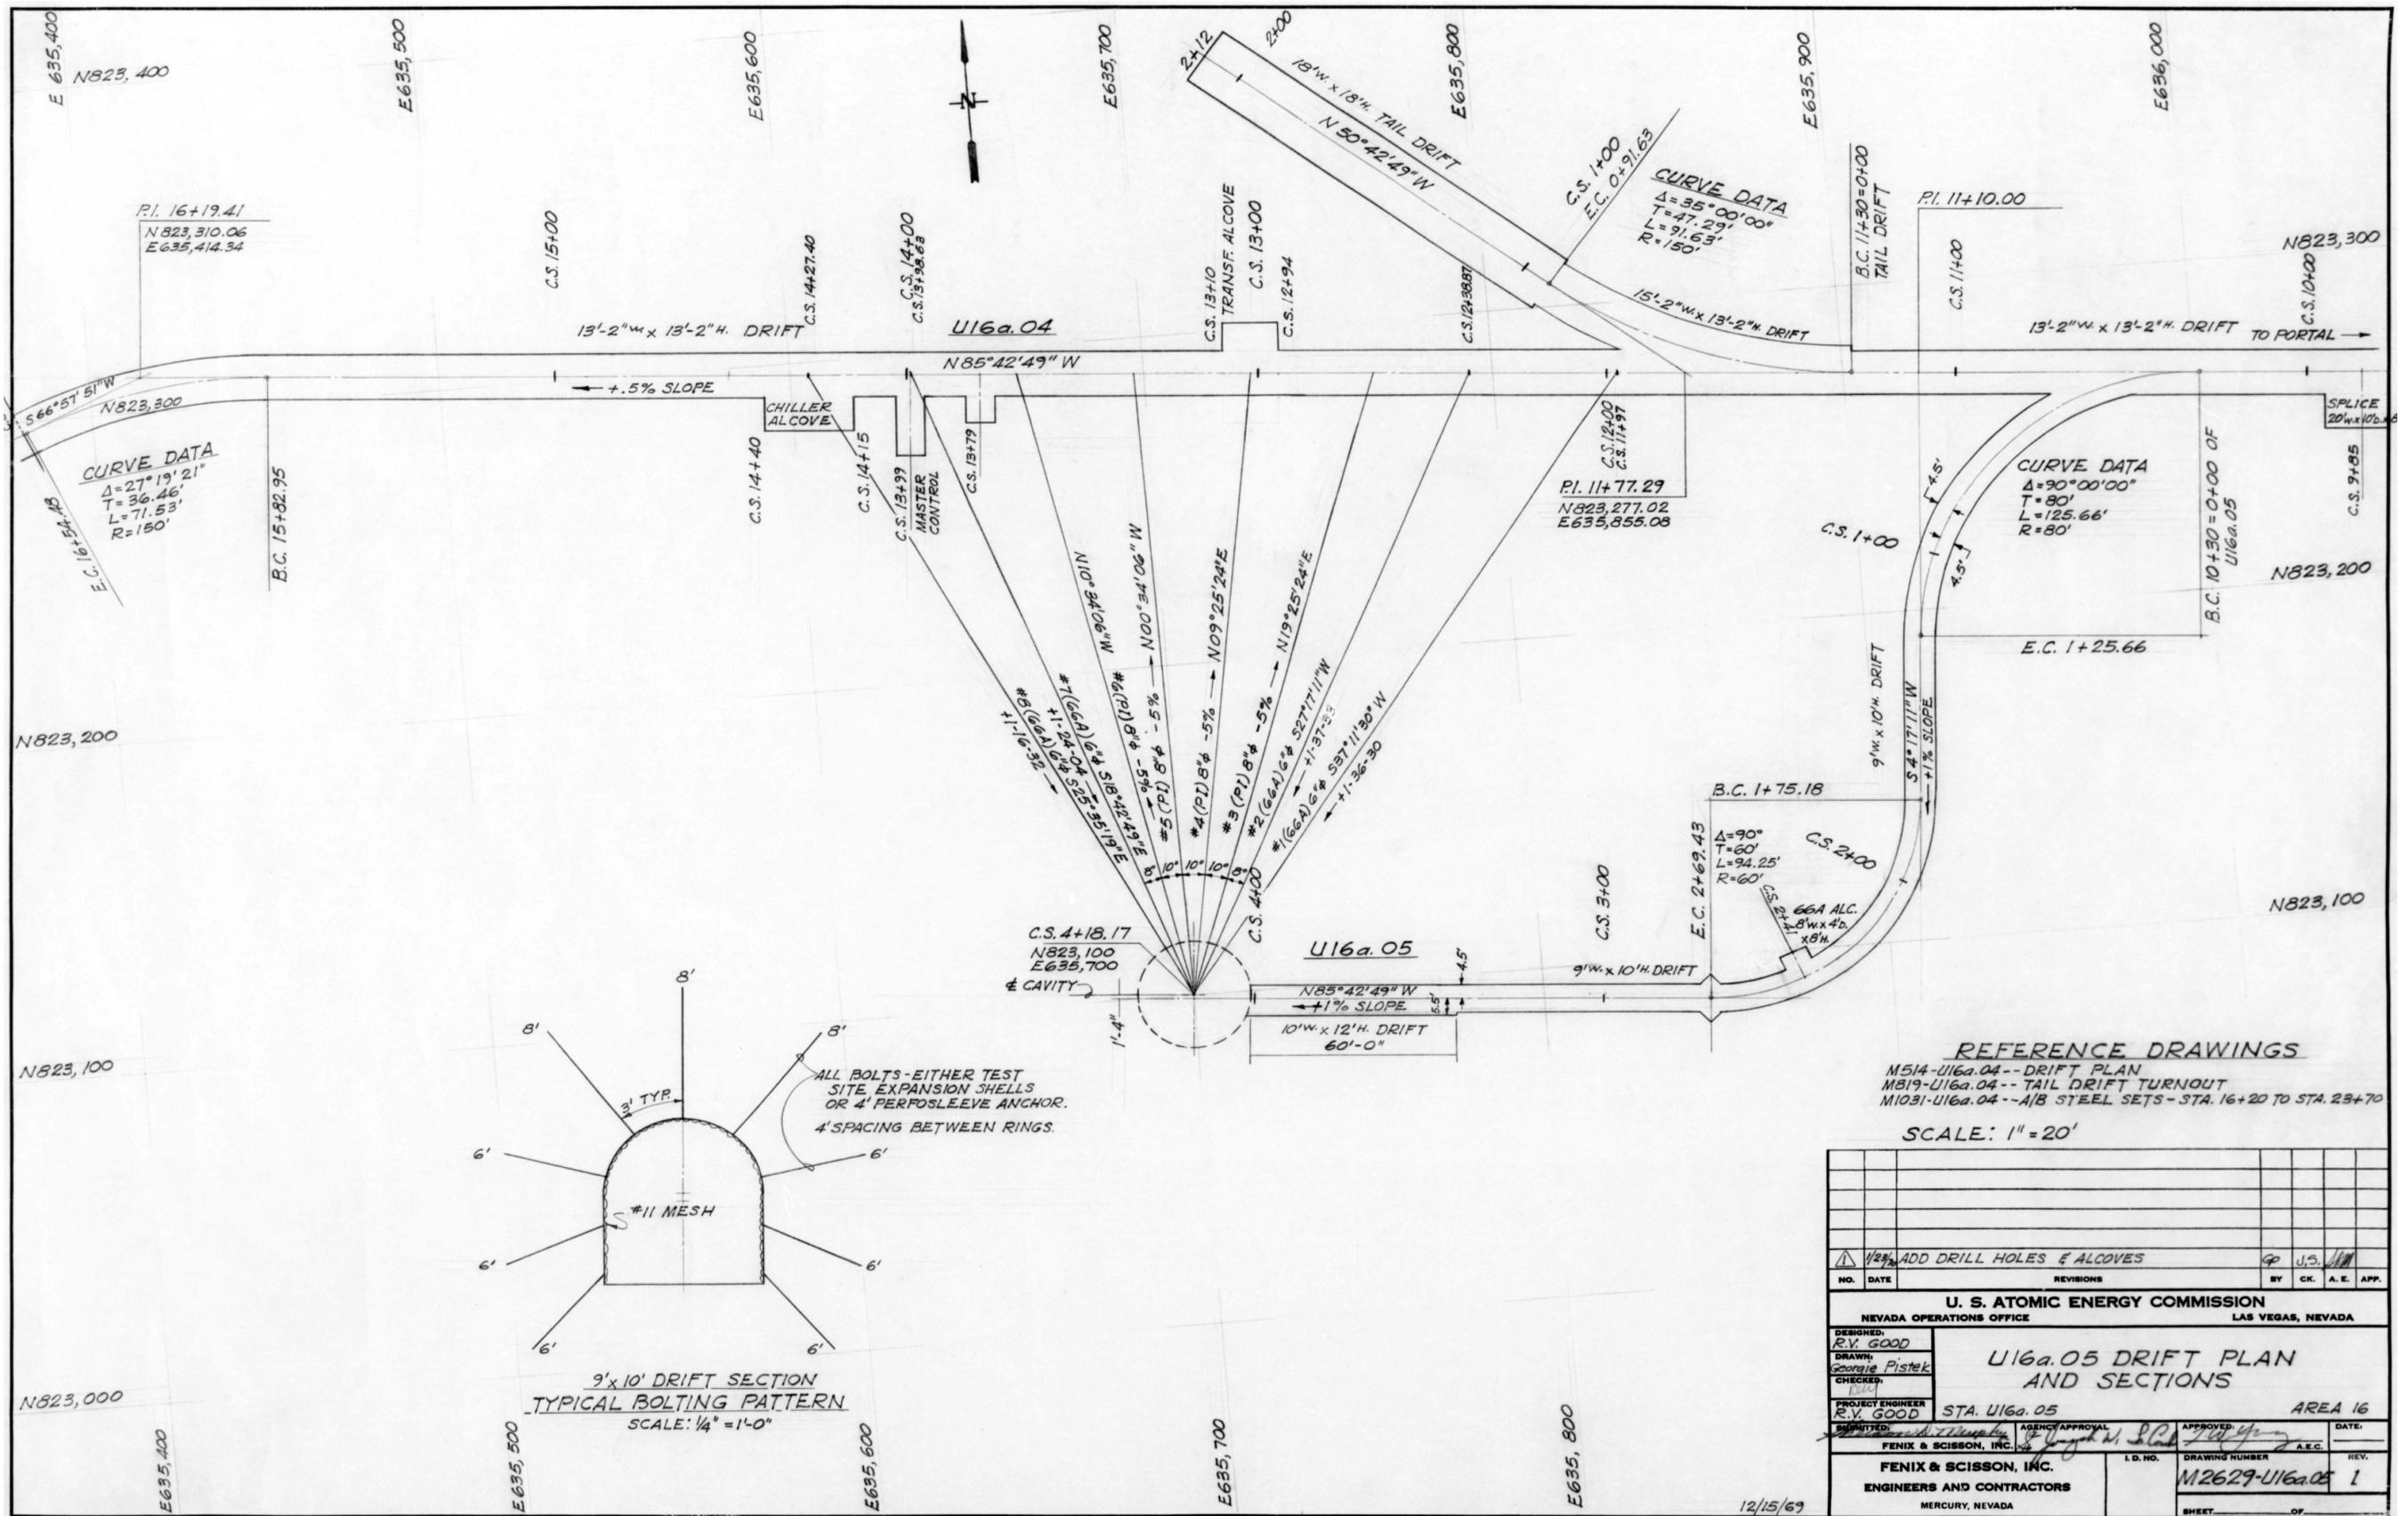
U16a.05 Diamond Dust drift plan and sections, 1970 (on file at the DOE Archives and Records Center).
